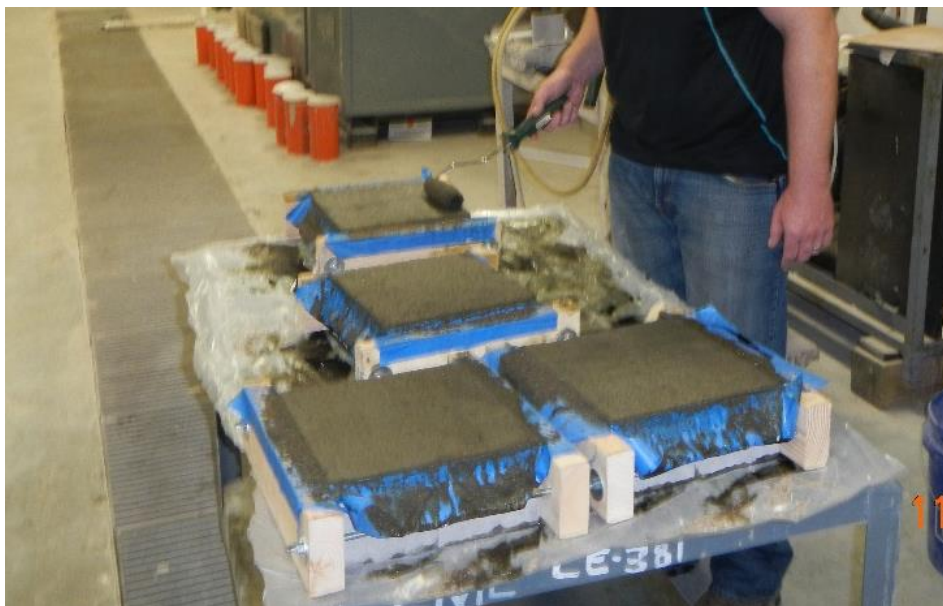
Back-rolling Healer/Sealer Specimens After Application of Sand
